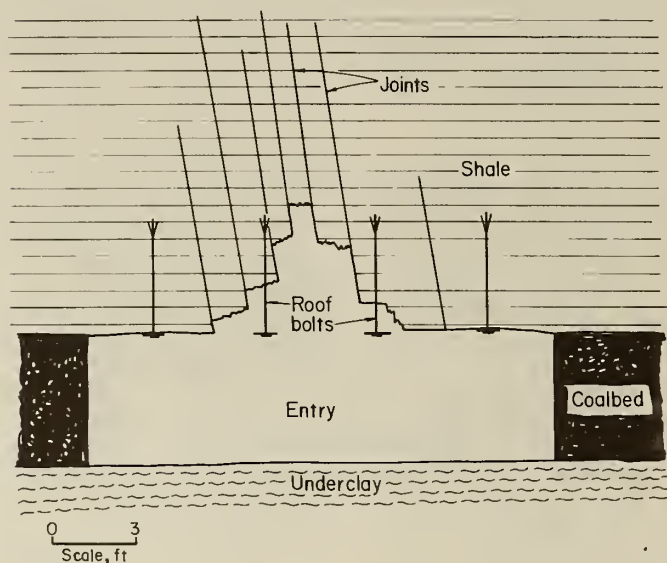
Subtype G_4 roof failure attributed to joints.
